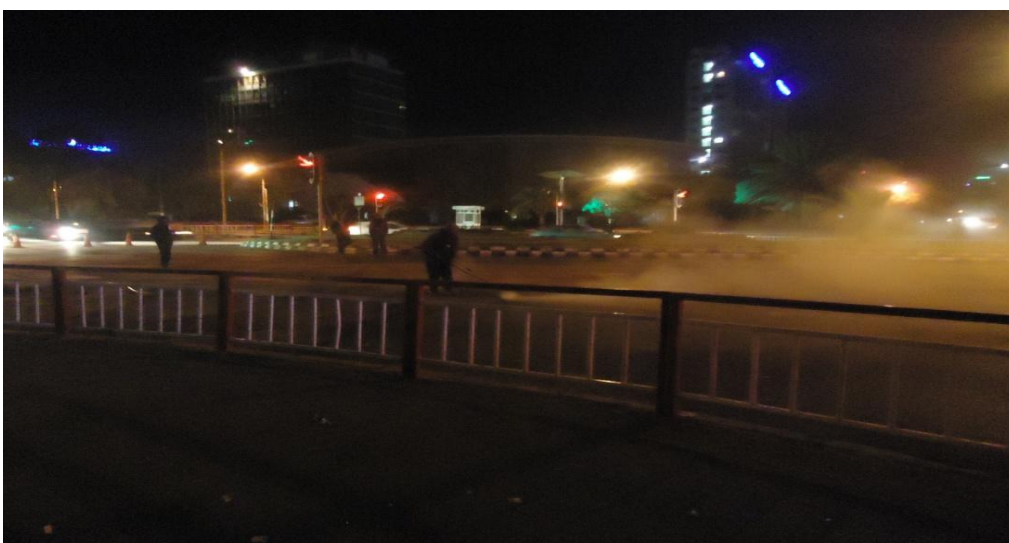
Photo taken during cleaning the surface using compressed air (during the night).
